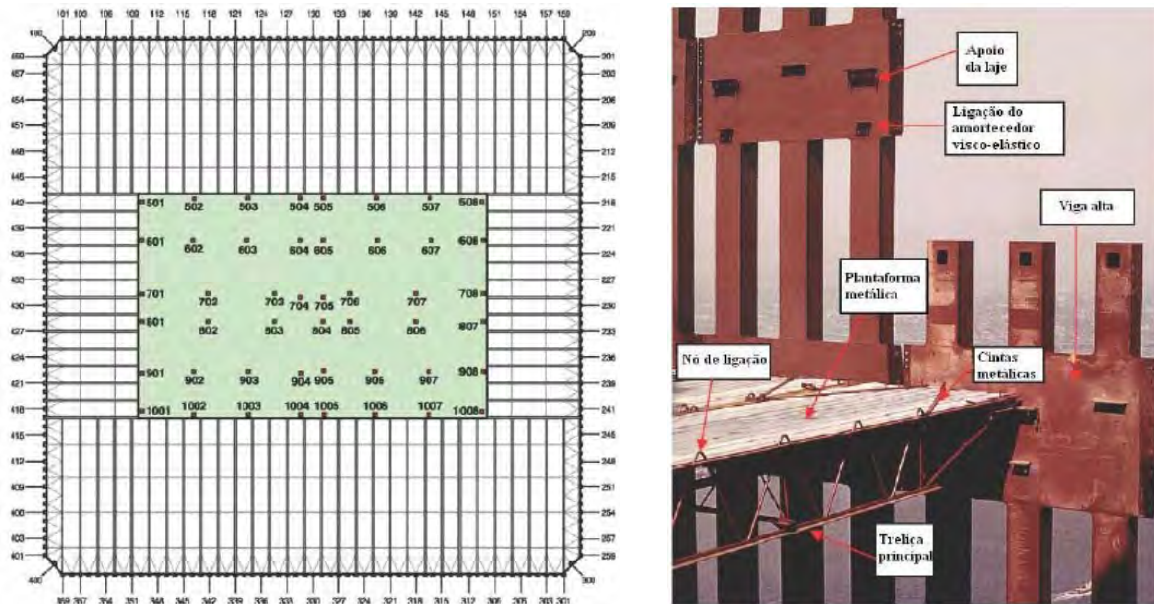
Structural plan of WTC tower-1 and detail of facade pillars with deep beam and metallic truss
